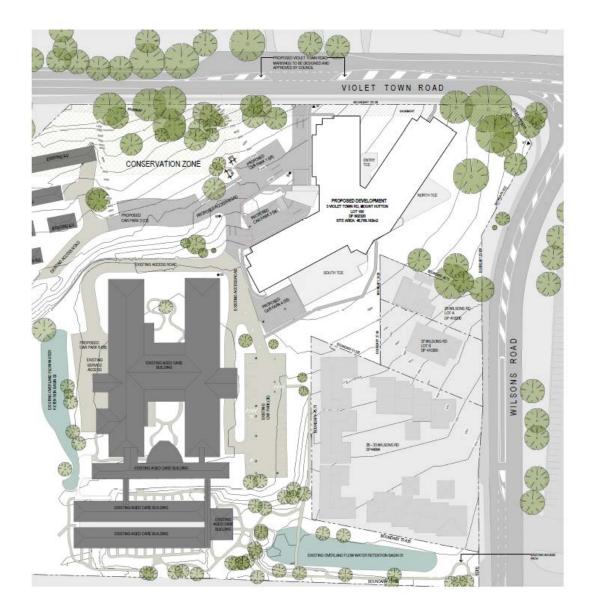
Extract from Plans submitted with application showing the location of the proposed building, access roads and parking areas
